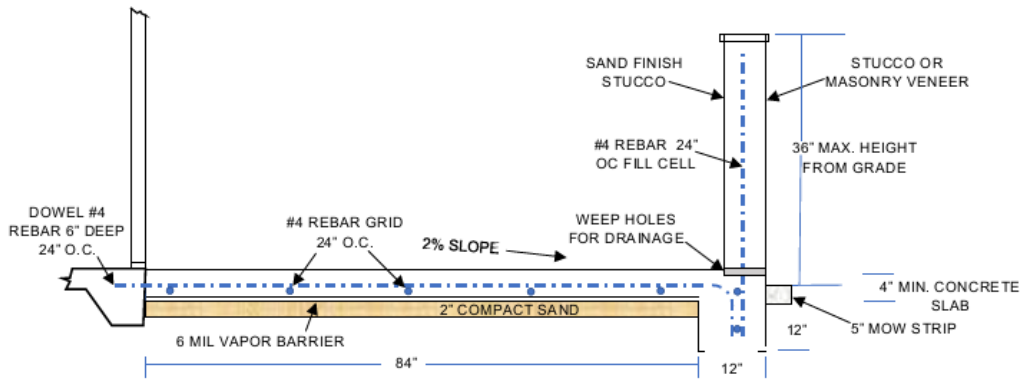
FIGURE A : TYPICAL CONCRETE PATIO WITH WALL
